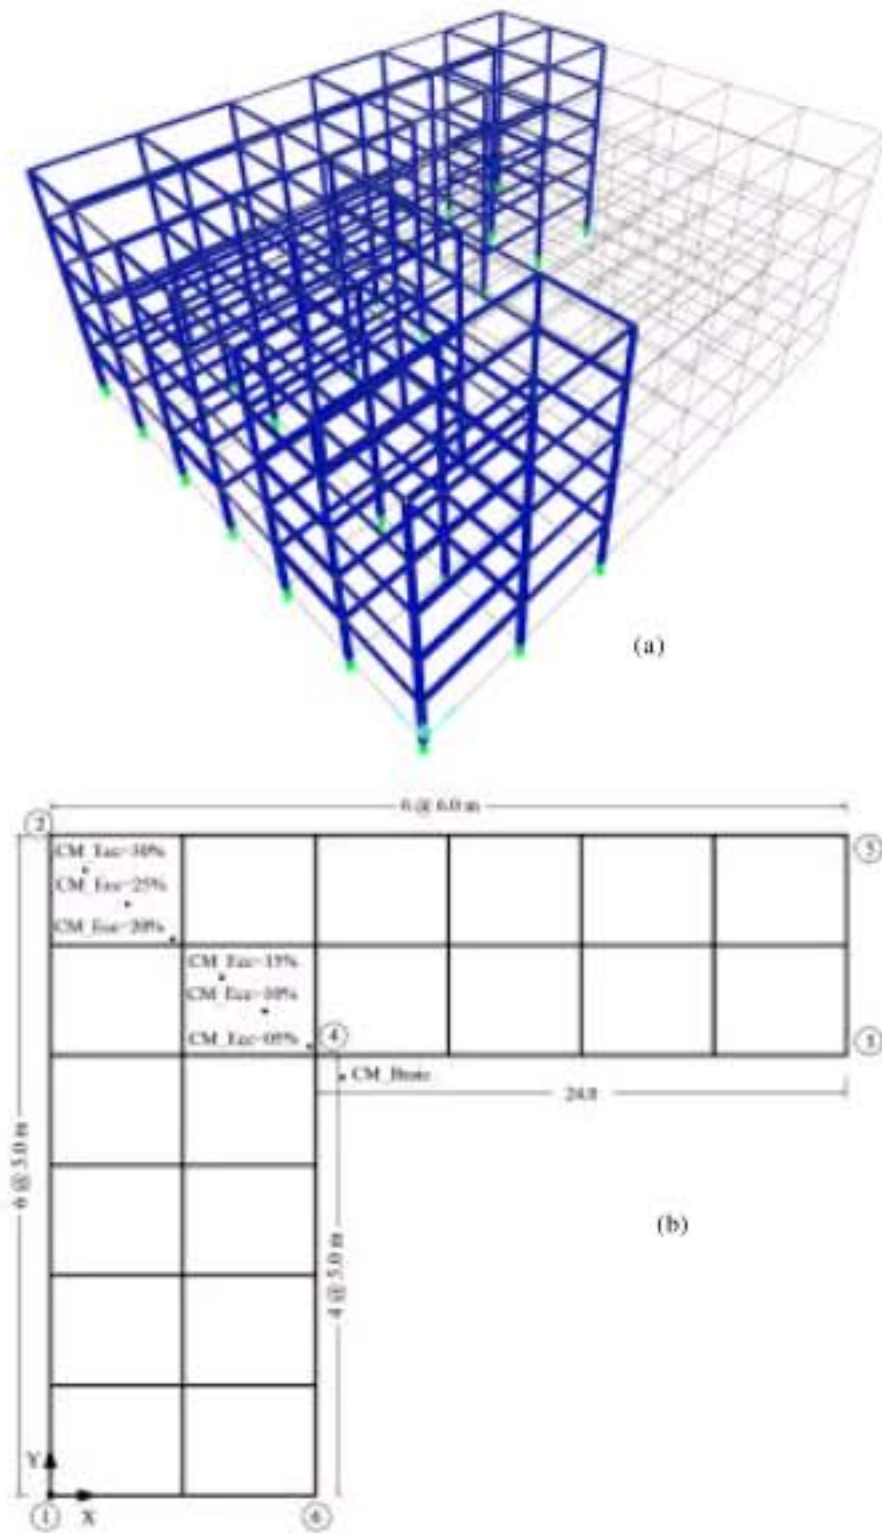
3D structure view and its typical plan (a) 3D view and (b) typical plan
